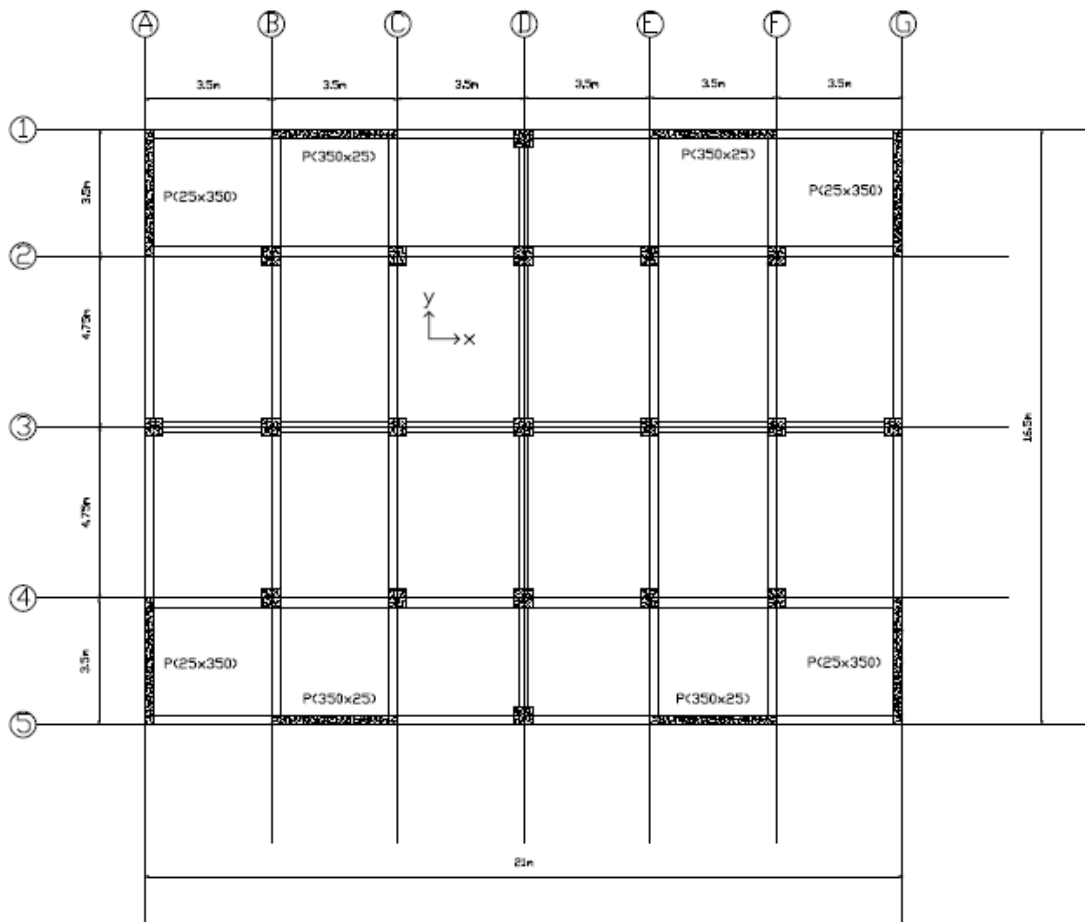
Plan of Model 22 with 50x50 Column Size and Wall Area to Floor Area Ratio of 1.0% in each Direction
